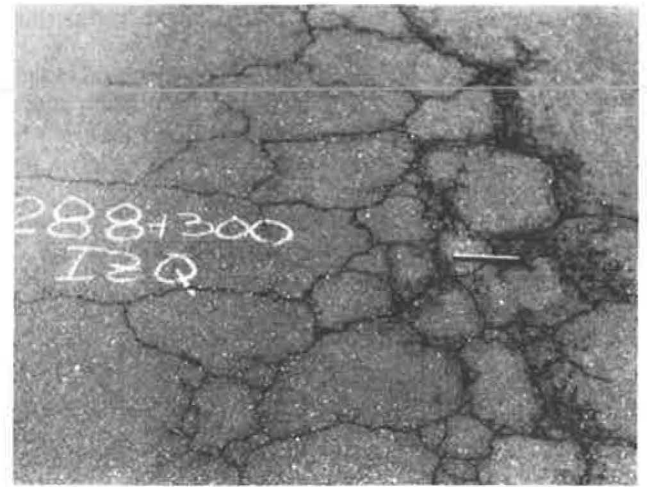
Typical pavement cracking, 3 years after completion of construction.
